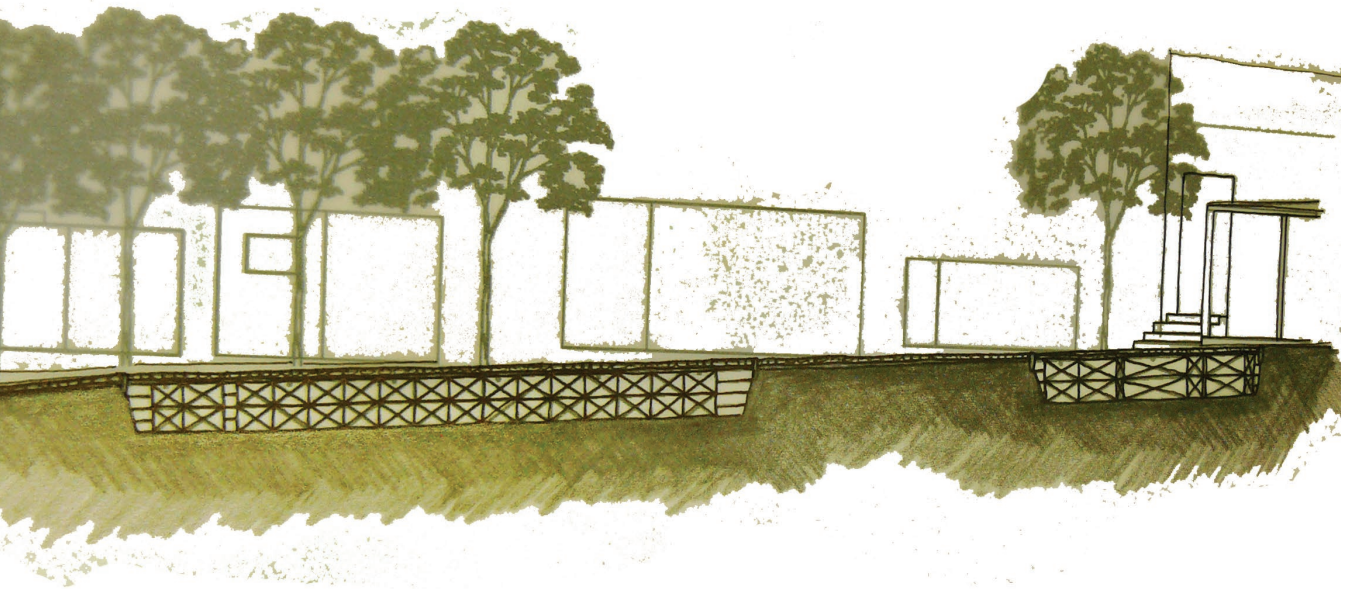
Section through Store Area cutting through two suspended pavement soil reservoirs (Author 2015)
